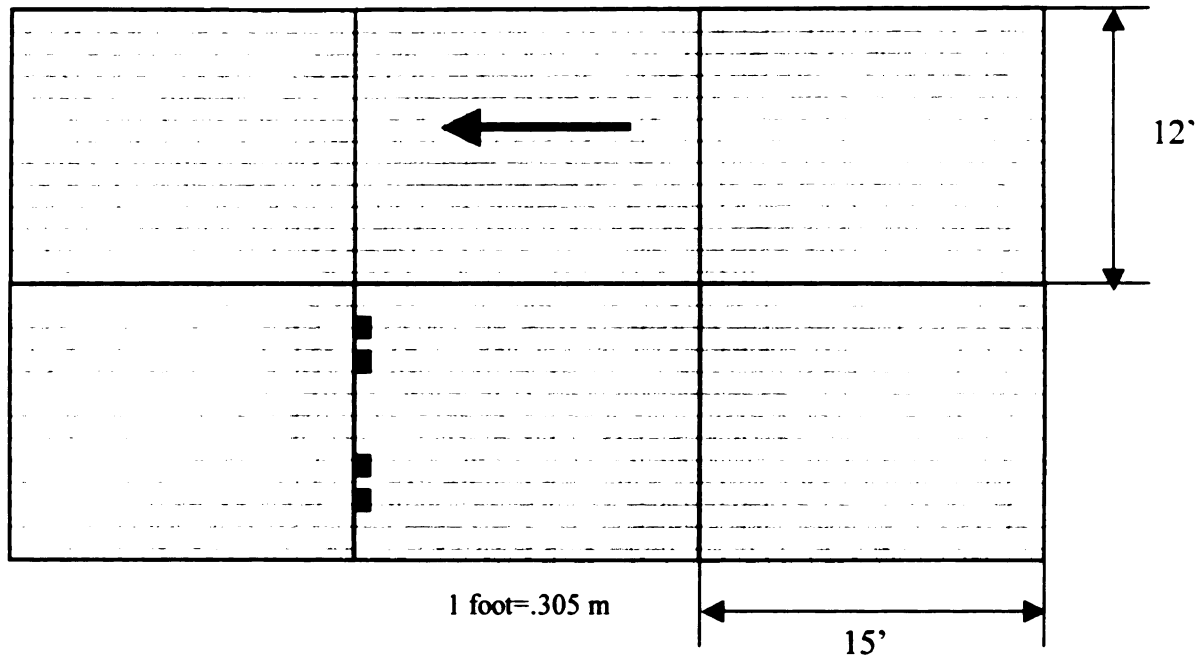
Slab Dimensions and FEA Mesh for Joint/Crack Load Position.
